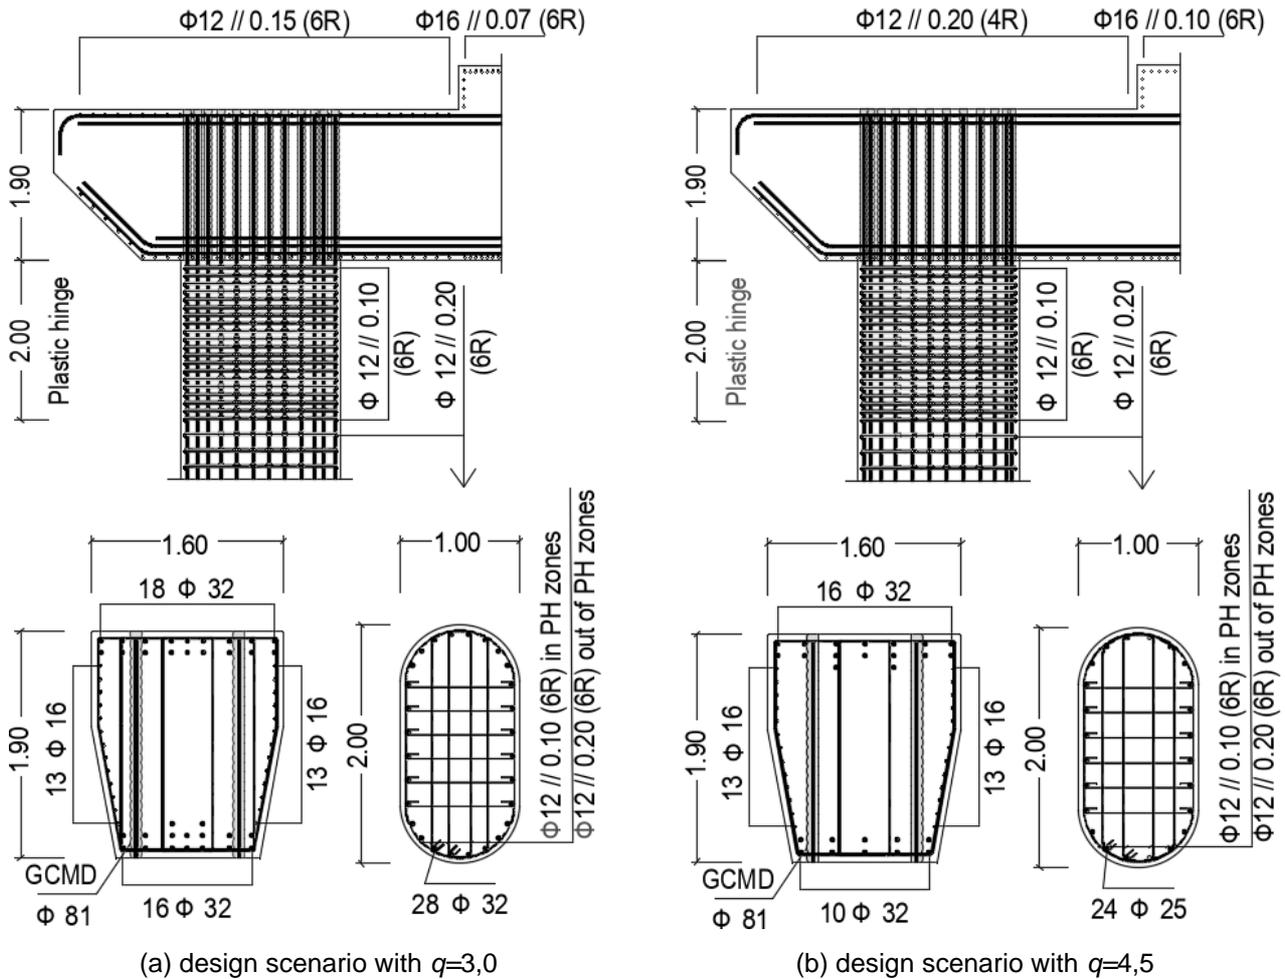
Column and cap-beam cross-sectional and reinforcement layout.
